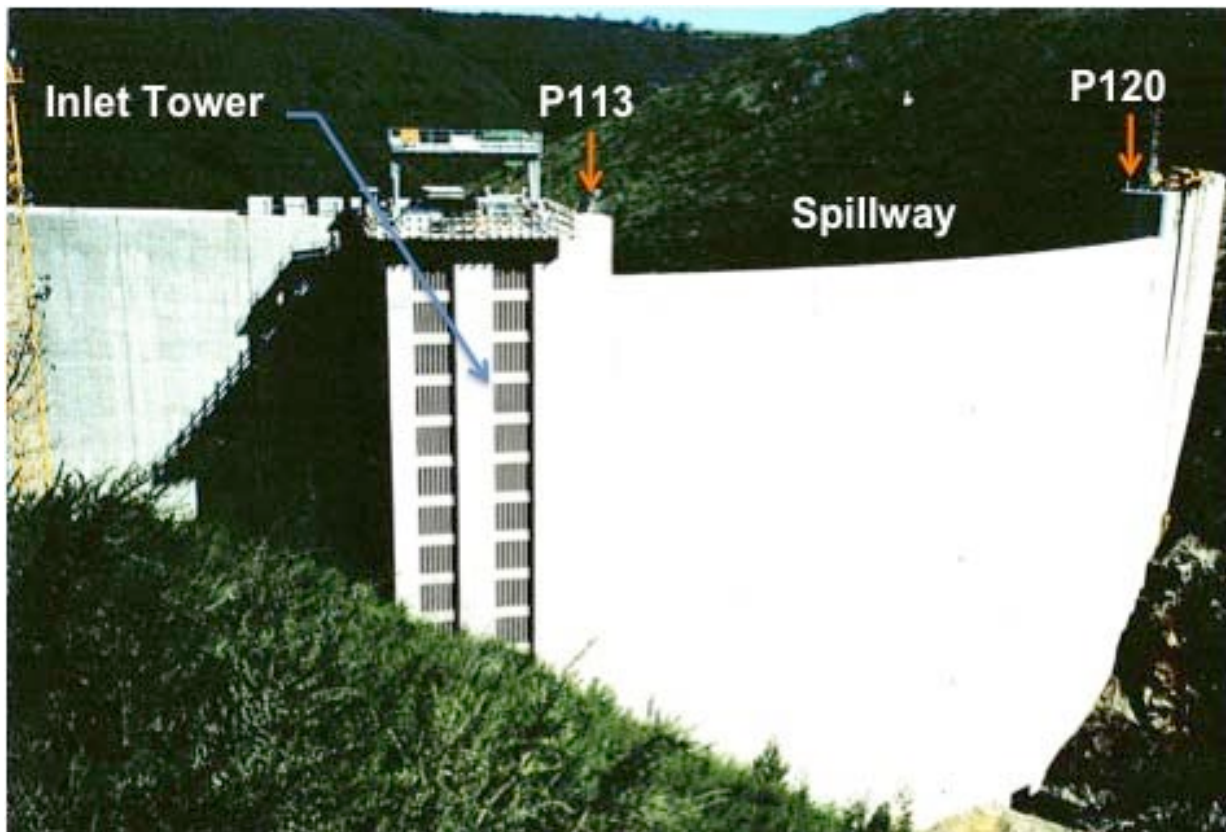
Upstream View of Dam Illustrating Beacons, Tower & Spillway
